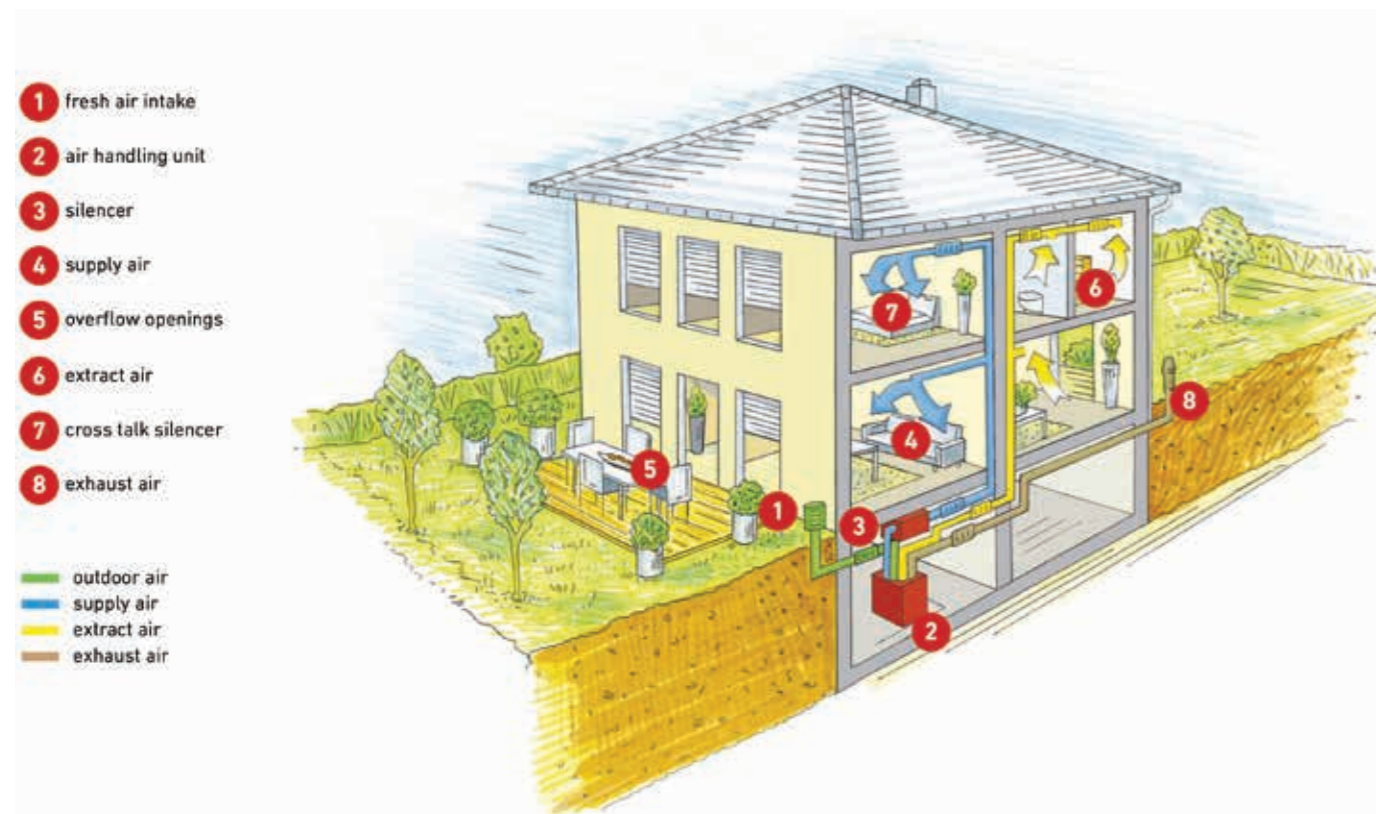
Air handling unit in detached and semi-detached houses ©J. Pichler GmbH
